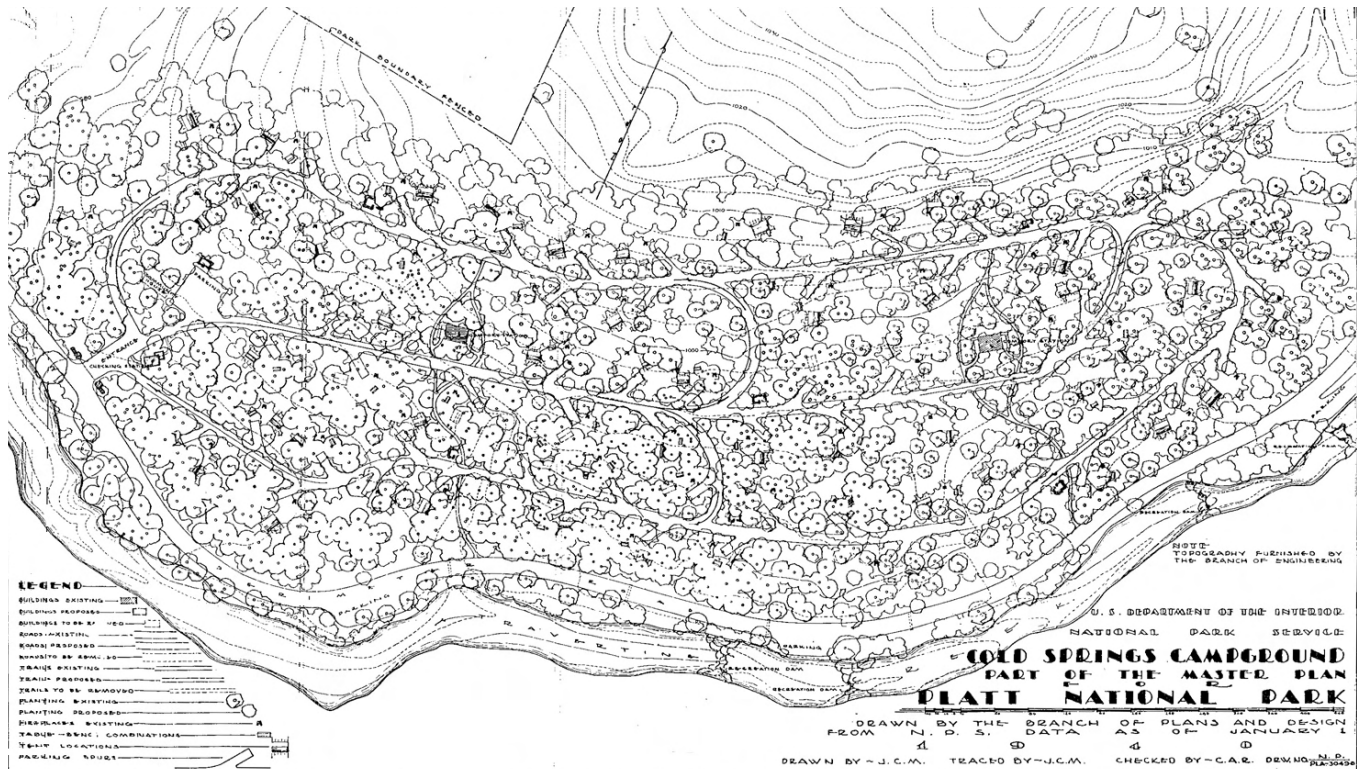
"Cold Springs Campground, Part of the Master Plan," Drawing NP-PLA-3049D, 1940.
